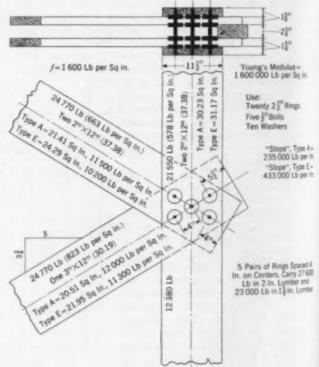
Enlarged View of the Highway Bridge Truss JOINT Z OF FIG. 7
